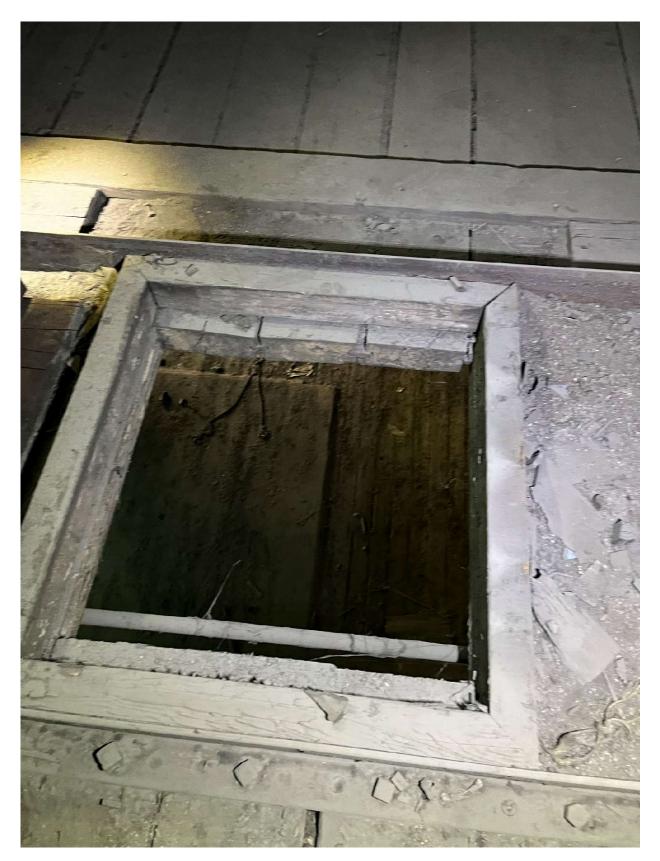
Typical Ceiling Hatch - Looking Down from Attic Space above West Gallery
